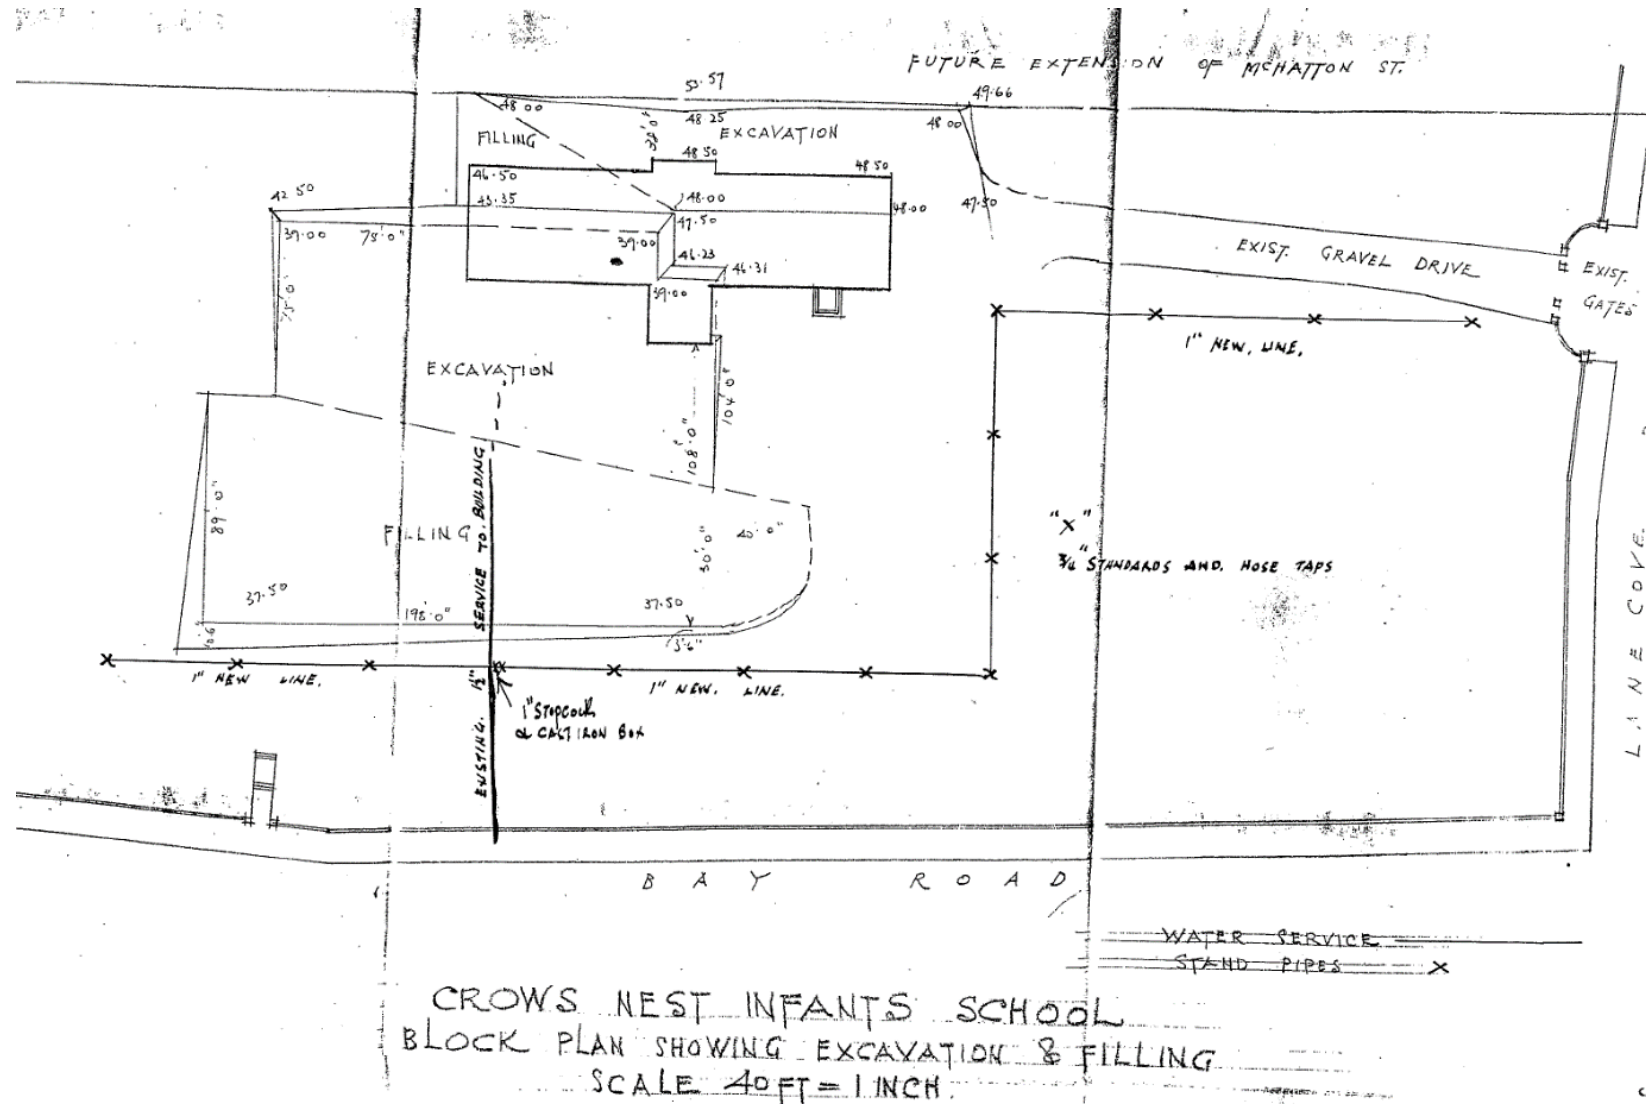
c.1930 Infants School Block Plan, showing extent of excavation and filling required to accommodate the building, as well as the original gravel drive from Pacific Highway gates (Source: NSPS Archives)
